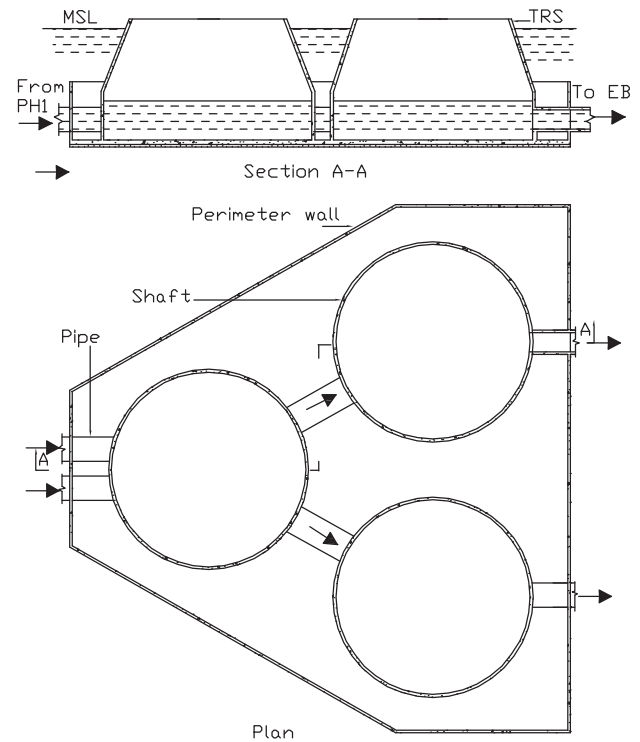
G.A. plan and cross-section of Tail Race Sump.
